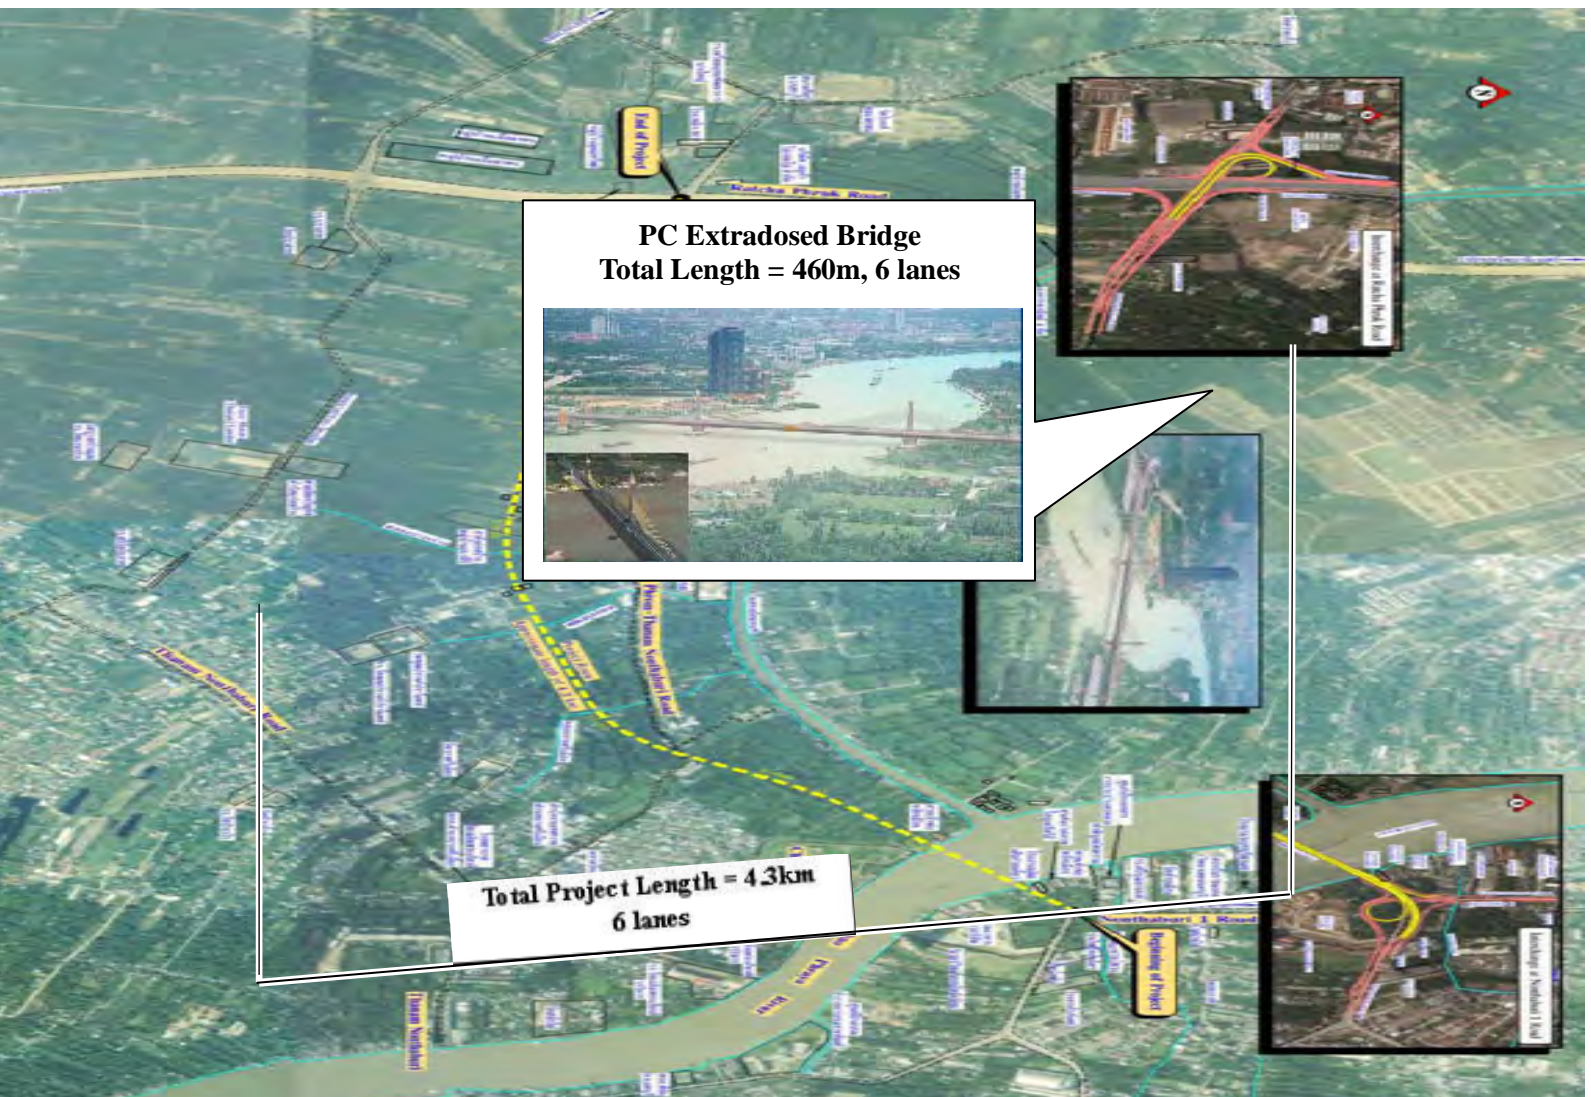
Outline of the Project “The Chao Phraya River Crossing Bridge at Nonthaburi 1 Road Construction Project”
